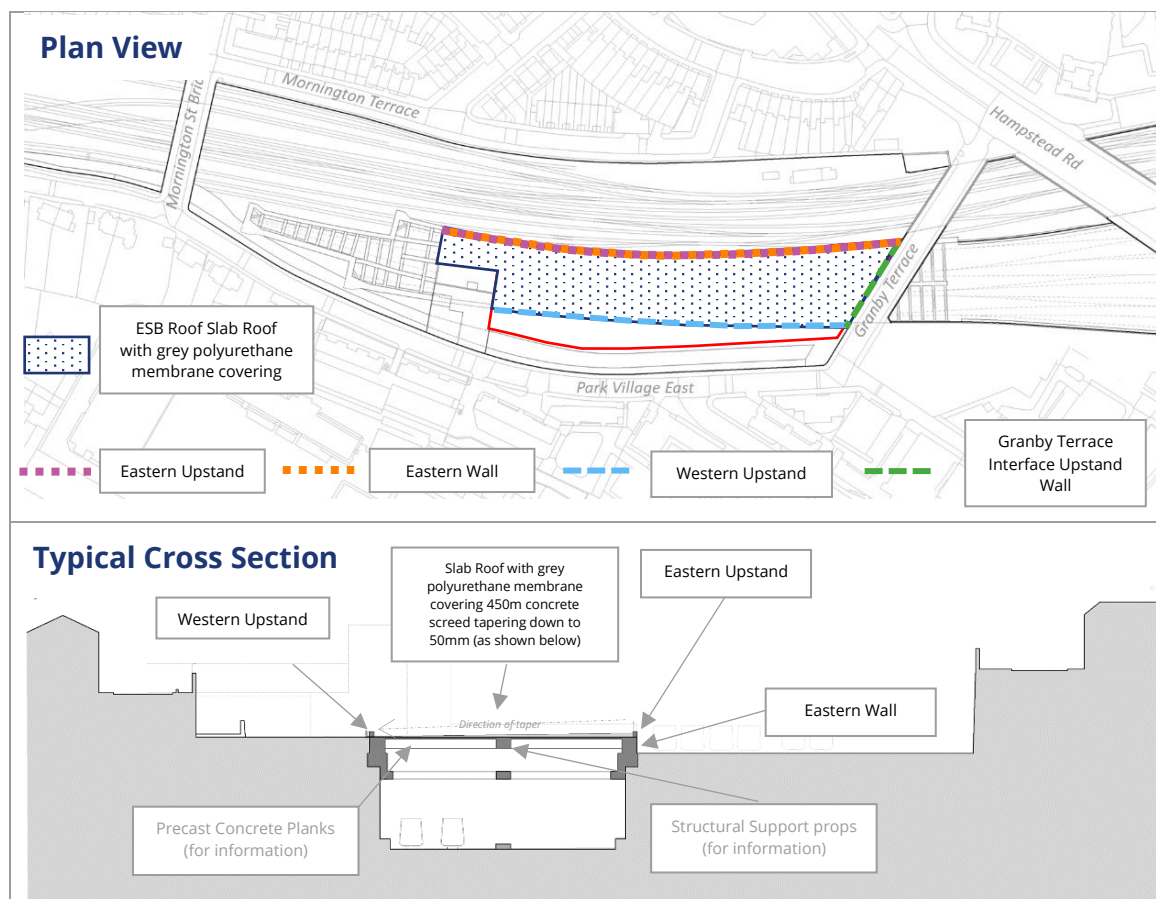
A Plan and a typical cross section illustrating the structural components of the ESB Roof Slab
